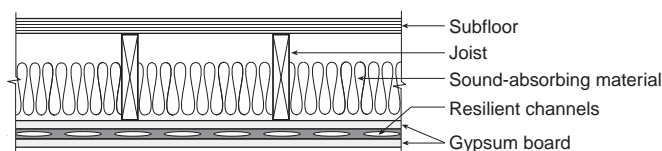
Resilient metal channels between two layers of 15.9-mm fire-rated gypsum board in the ceiling give this construction an STC of only 38. As shown in Table 4, removing the internal layer of gypsum board gives an STC of 52 for an OSB subfloor. Putting both layers below the resilient metal channels gives an STC of 55.
